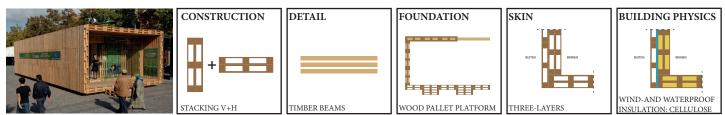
The pallat house. Source: Fig 13. Connection, detail, foundation, skin and building physics method. (Own image) (Meinhold. B, 2010)
